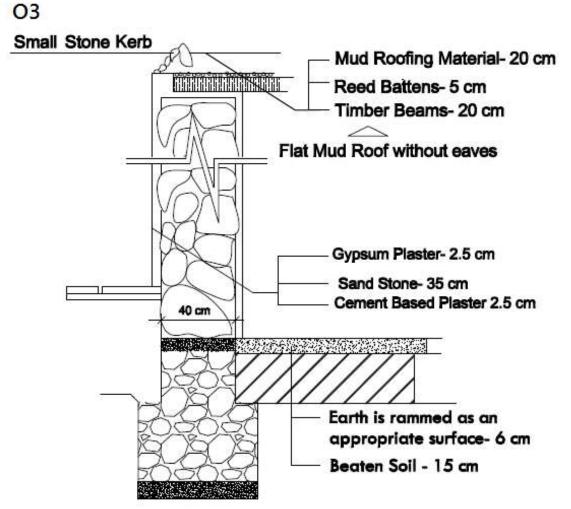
Construction Technique in Ottoman period- Stone wall- O₃
